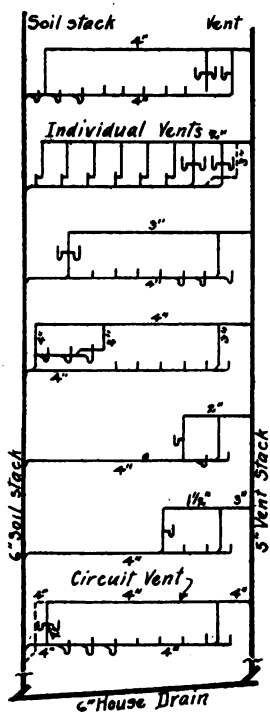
Showing maximum number of fixtures permitted on a 4-inch soil stack as provided in Chart A, and illustrating the minimum standard and basic principle of re-venting for such installations. For details see various Code sections and sketches.
